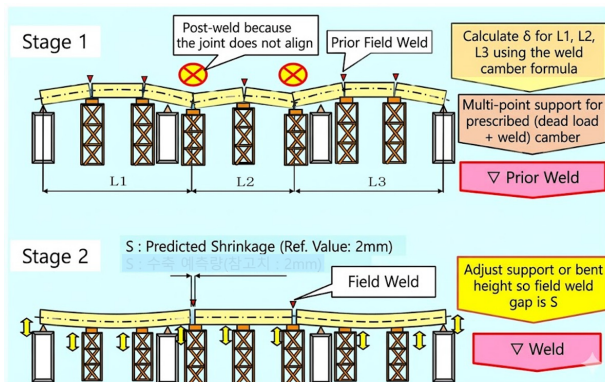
General welding procedure for field welding only the top of girder
